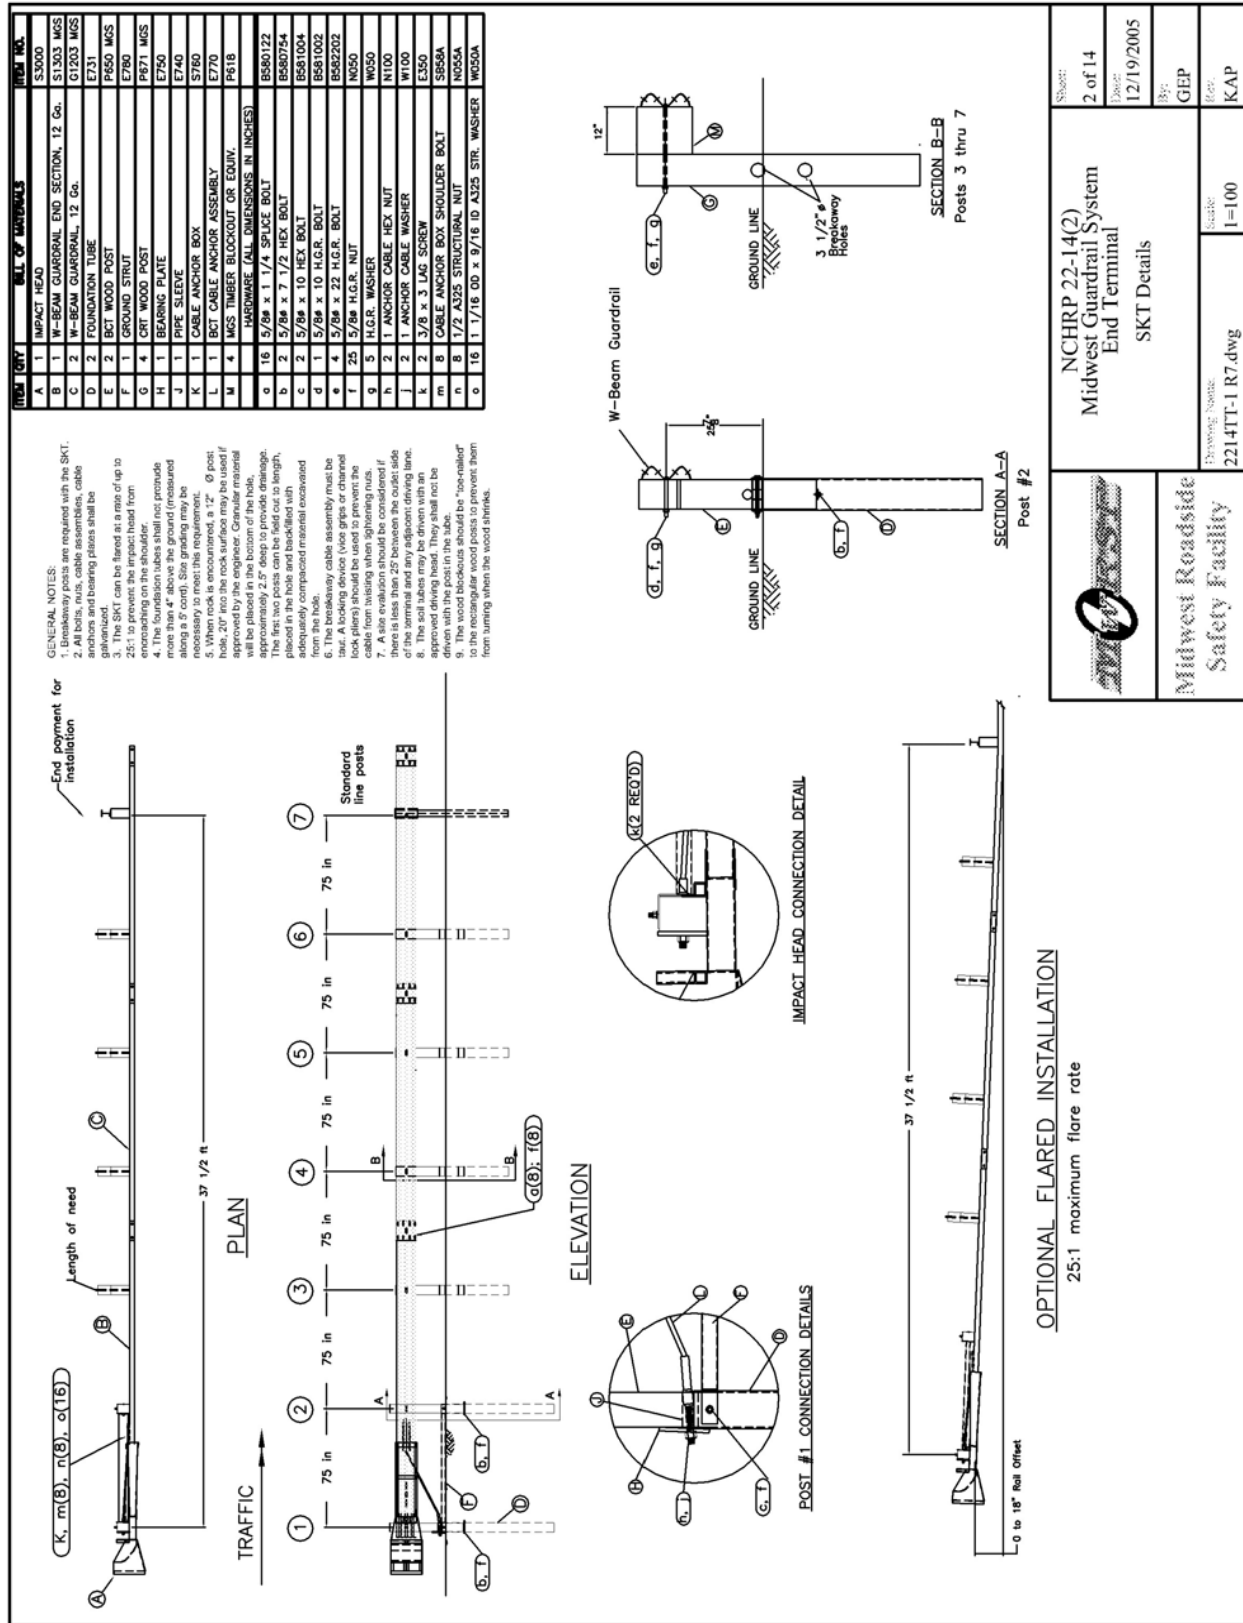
Midwest Guardrail System End Terminal - SKT Head Details (English)
